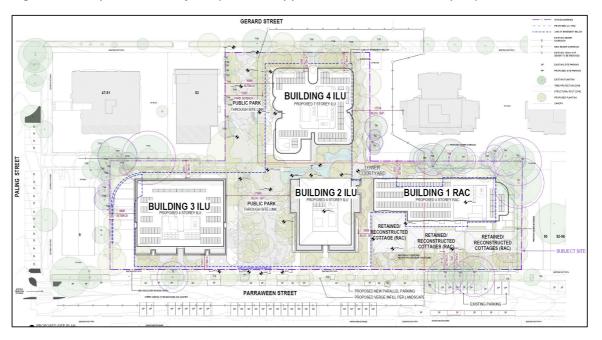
Proposed Site layout (source: Applicant's Amendment Report)
